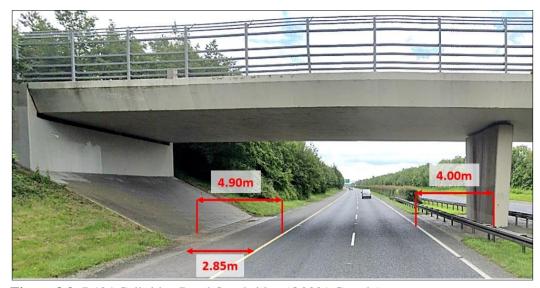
R404 Celbridge Road Overbridge (©2021 Google)
